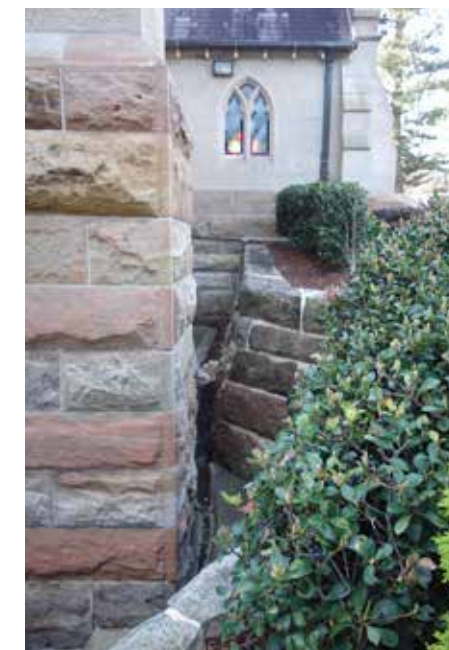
Retaining wall at the south eastern corner of the South wing.
